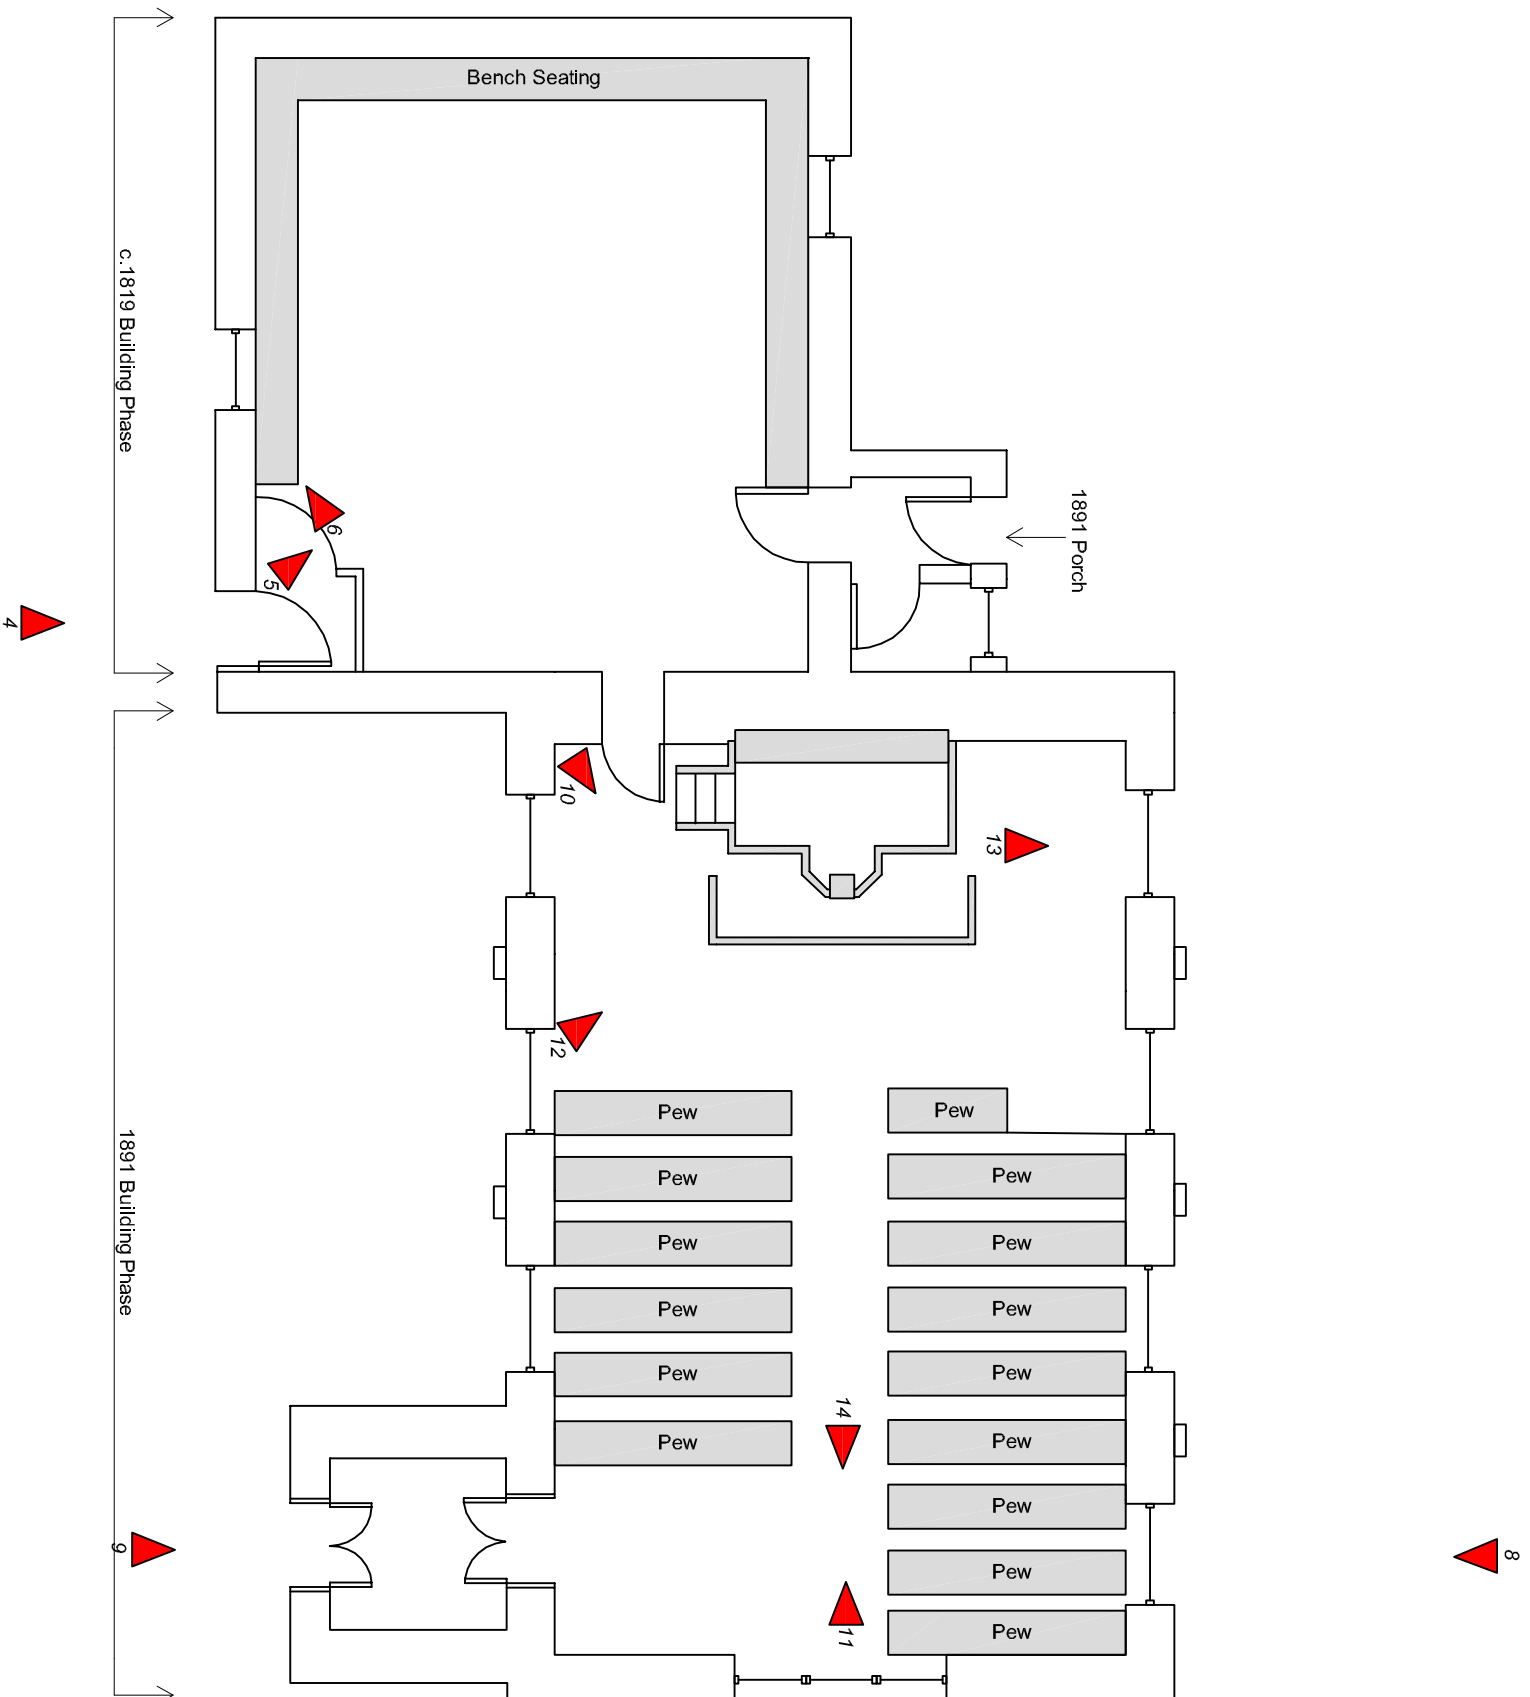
Plan of Bainbridge Methodist Church and the external and interior viewpoints of plates 4-6 and 8-14 within the report. Based on a drawing provided by the client.
